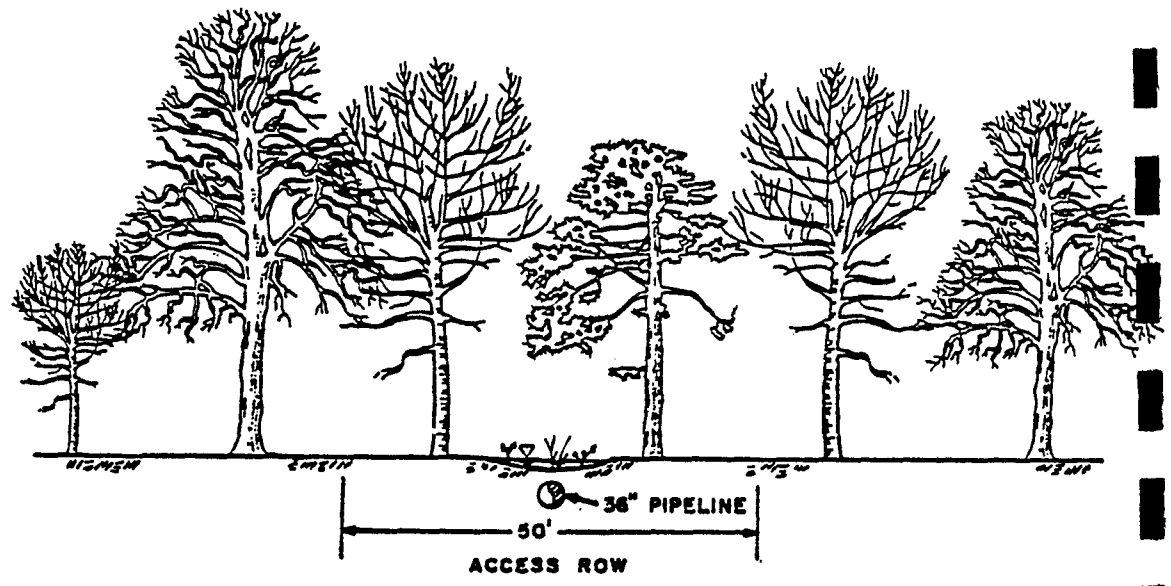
Typical Cross-Section of Conventional Push Ditch Pipeline Construction After Excavation and Several Years After Backfilling.
